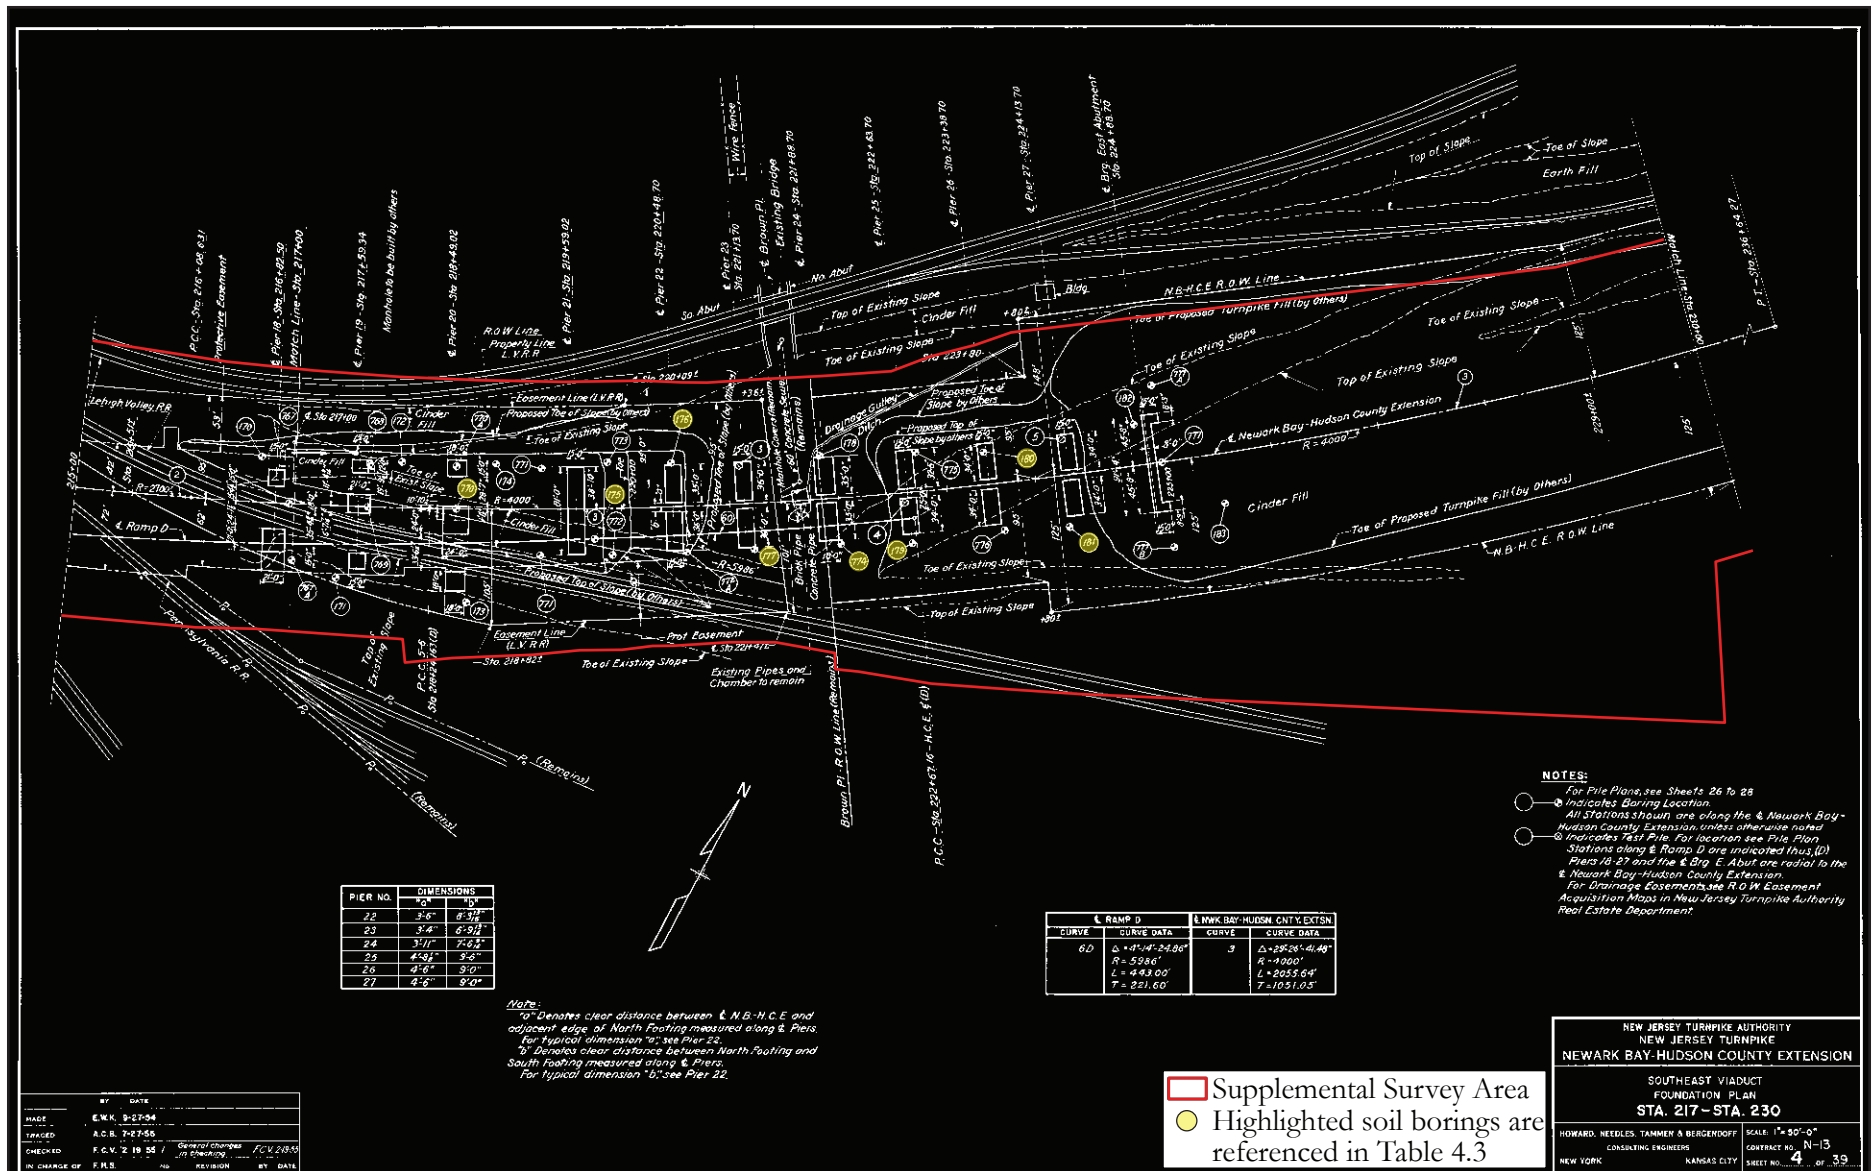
Southeast Viaduct Foundation Plan, Station 217-Station 230, showing soil boring locations (Howard, Needles, Tammen and Bergendoff 1954a).
